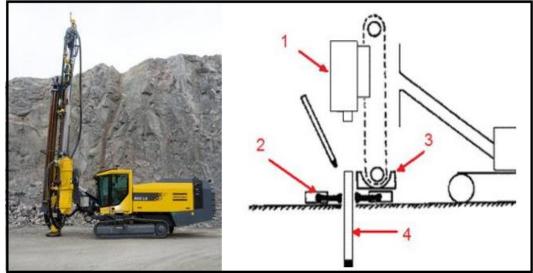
Drilling rig with the drill at the bottom of the bore hole and the main components: 1- rotary engine; 2- pliers for change of rod; 3- feed motor; 4- hammer and cutter bit
